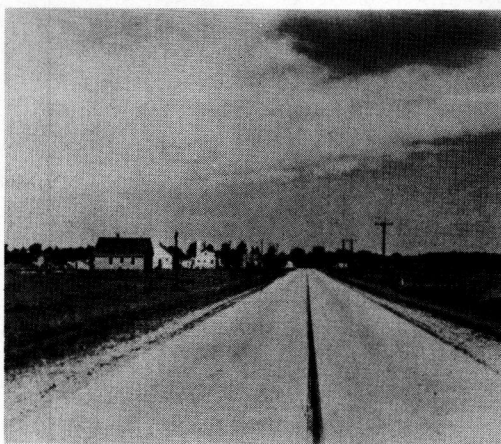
Pavement constructed in 1927 without transverse joints, Clyde soil in foreground, Fox soil in background; crack interval ranges from 15 to 50 feet or more. Photo taken in 1944 by A. T. Bleck.
